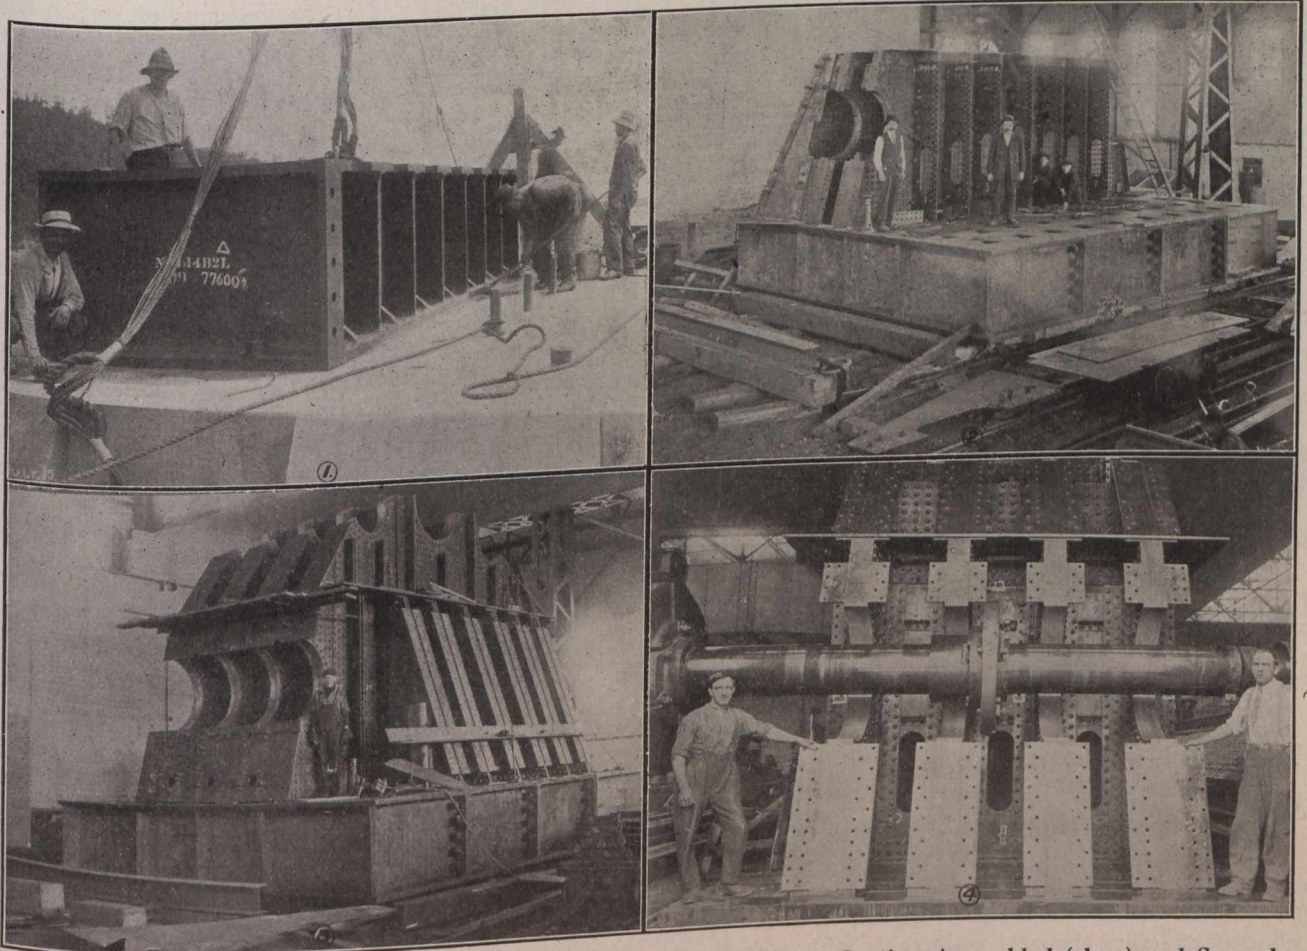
One of the 4 Castings Being Placed on the Pier. Fig. 2.—Casting Assembled (shop) and Second Story Under Construction. Fig. 3.—Second and Third Stories Nearing Completion. Fig. 4.—Method of Boring 45-inch Pin-hole.
